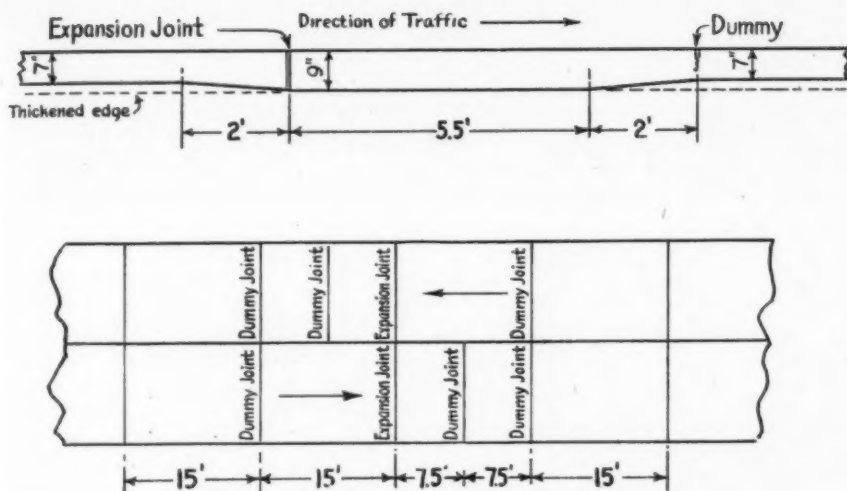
Top, longitudinal section, bottom, plan, showing spacing of dummy points adjacent to expansion joints when dowels are eliminated
